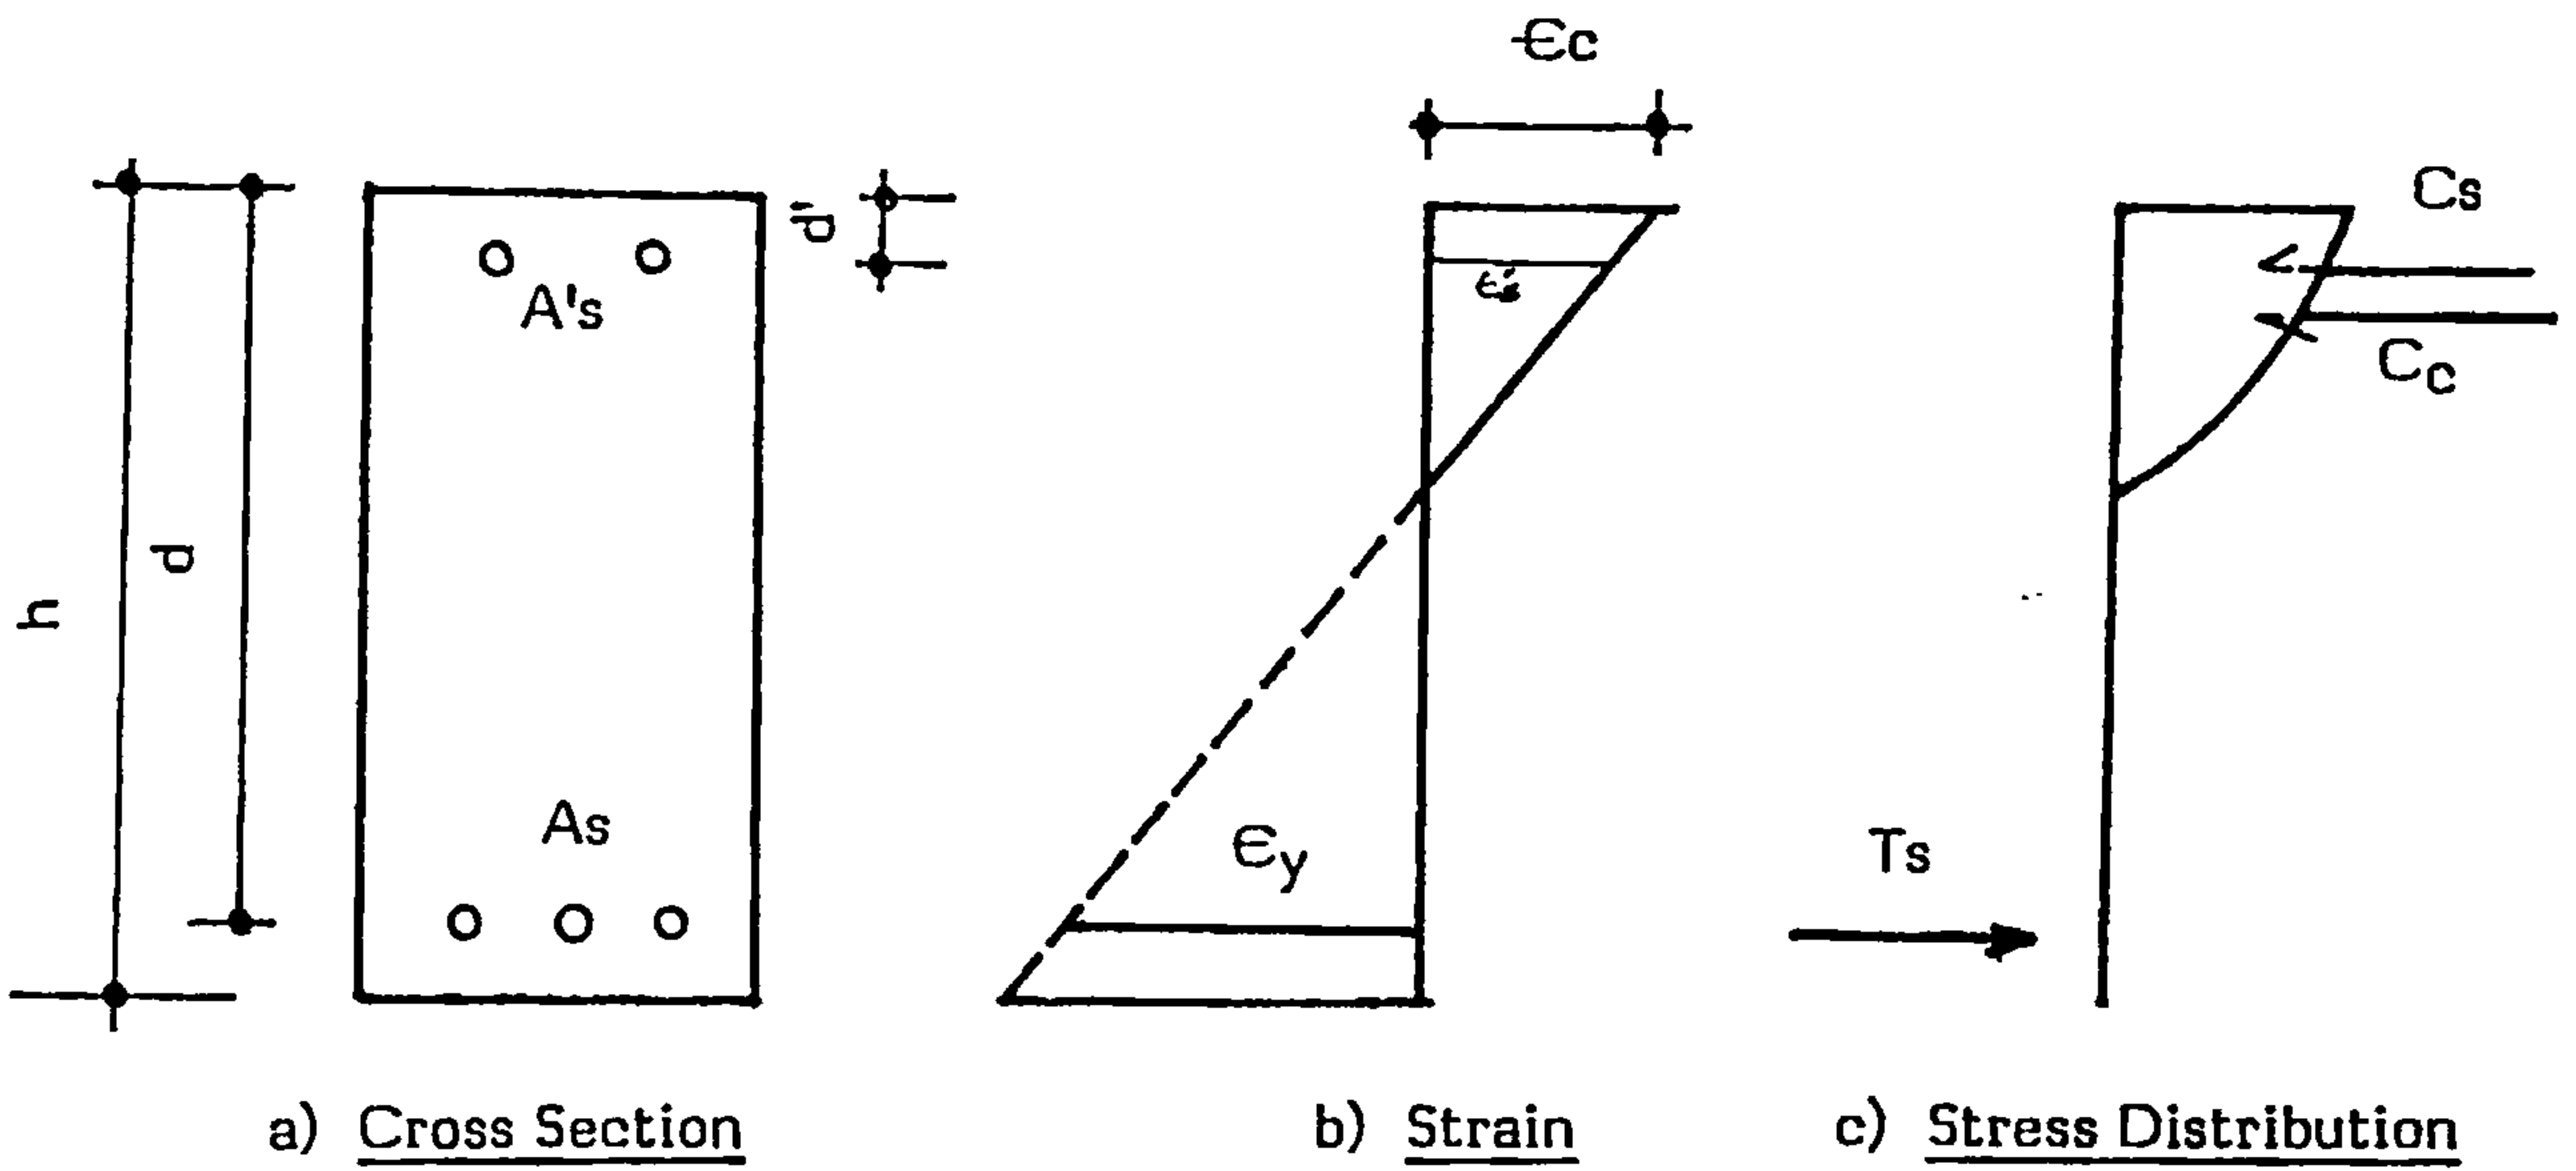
DISTRIBUTION OF STRAIN AND STRESS OF A TYPICAL CROSS SECTION AT YIELD
